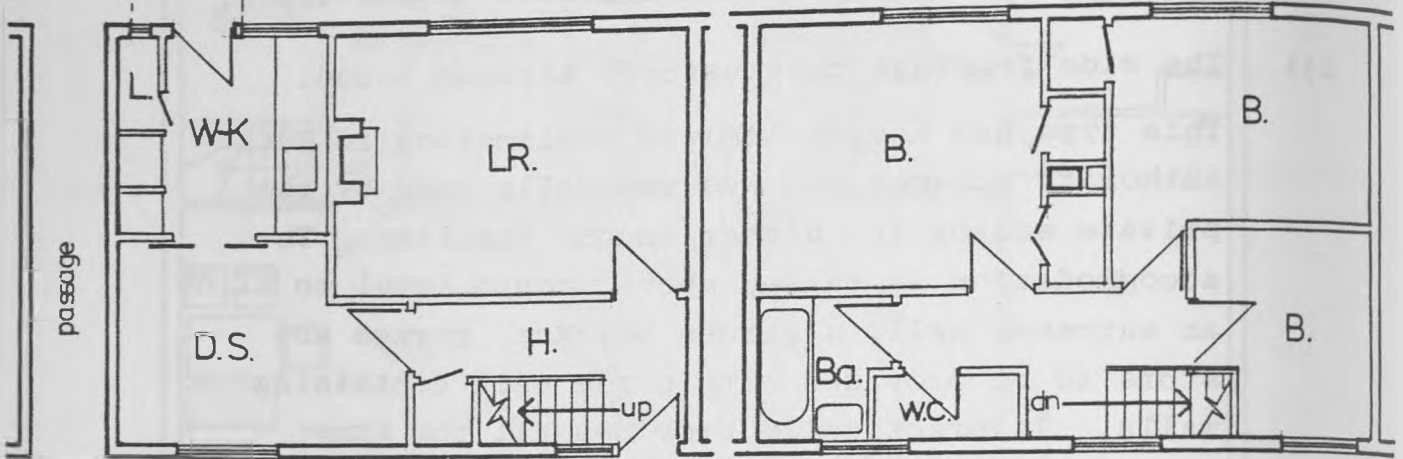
TERRACE HOUSE WITH ACCESS THROUGH THE STORE AND KITCHEN
